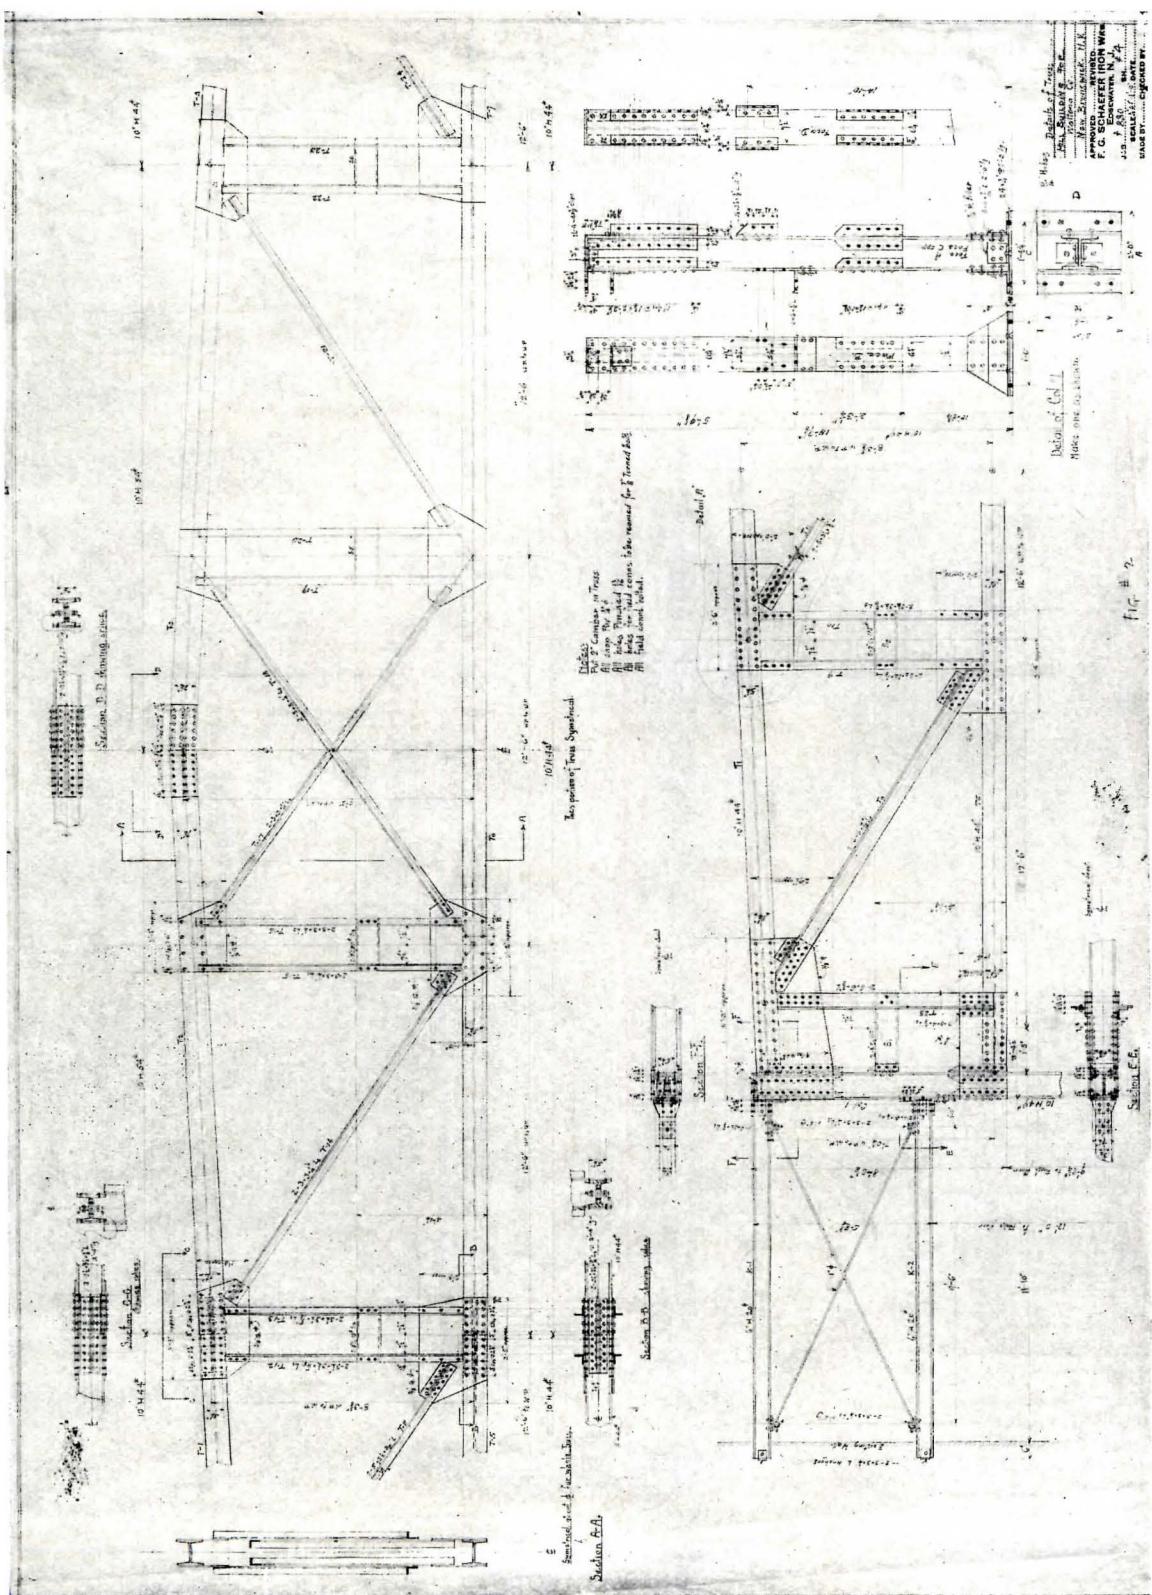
Details of Truss. Mill Building for Waltons Co., New Brunswick, N. Y.
